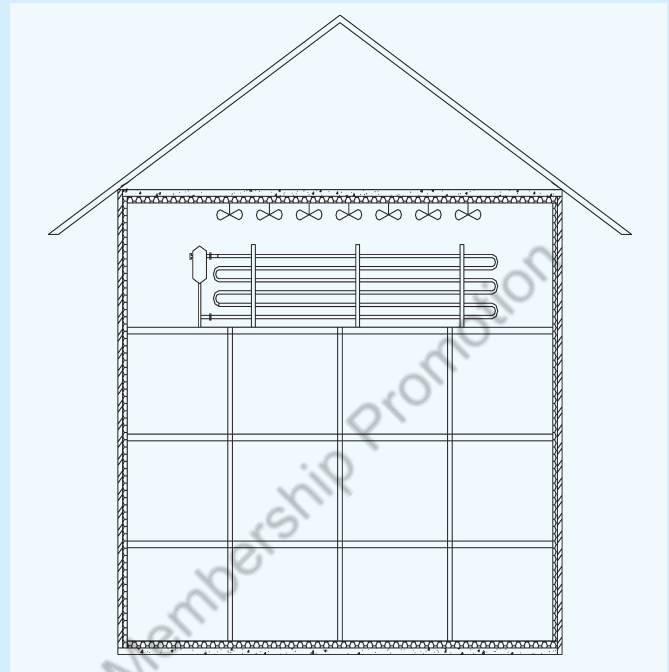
Typical old design of cold store with steel roofing and large bunker type cooling coil (section).
